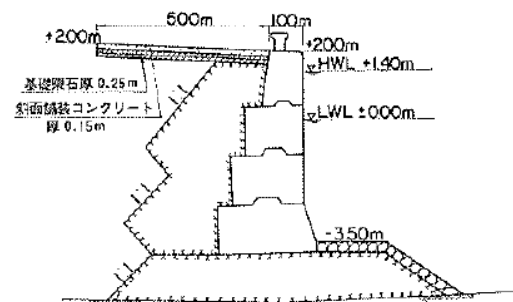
Cross section of the sea wall of concrete block type in Onagawa fishery port(港空研HP, 2011).
